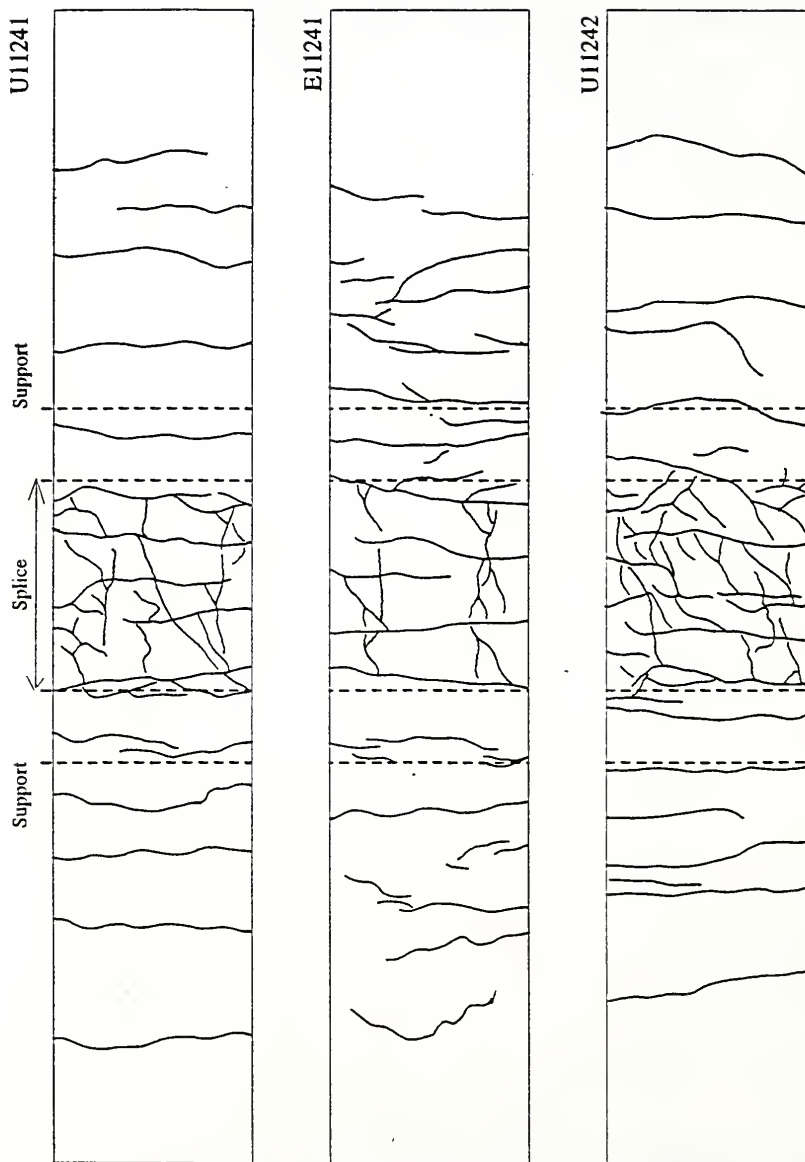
Crack Patterns at Failure, Type B Specimens
